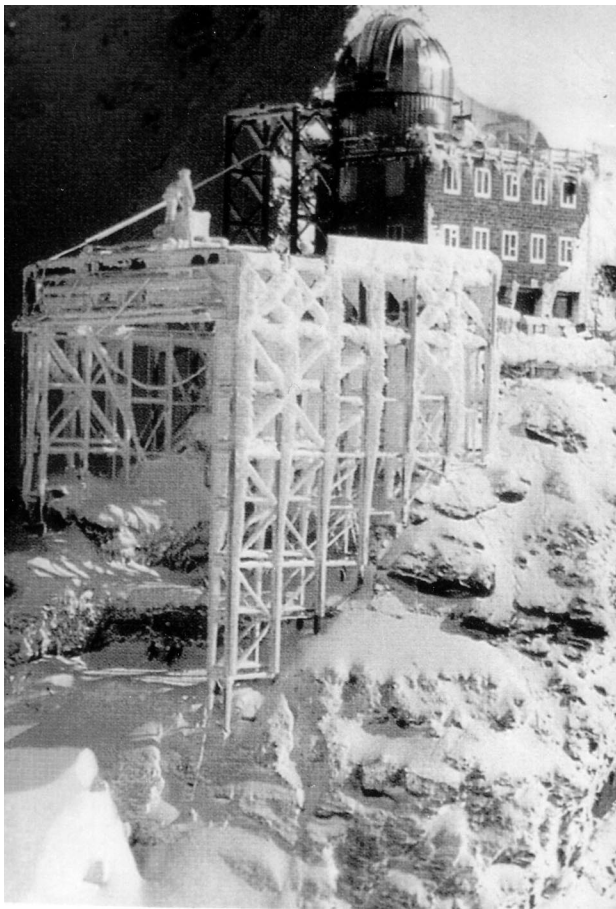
The old Sphinx observatory and the construction site in winter 1993/94. To enable construction work throughout the whole year a protection shed was erected after excavating a total volume of 1,000 m<sup>3</sup> of rock material.
